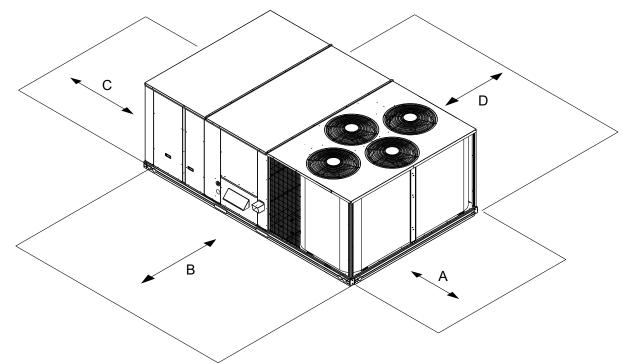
Unit Dimensional Drawing – 29 Size Unit (cont.)
